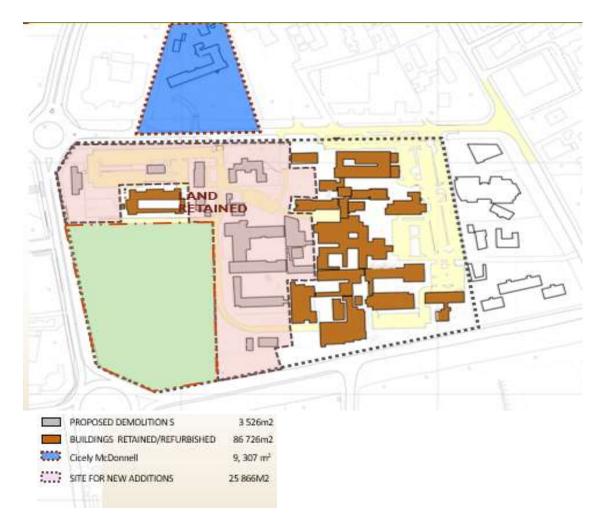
Site Layout. Source: Nairobi Hospital Master plan)
